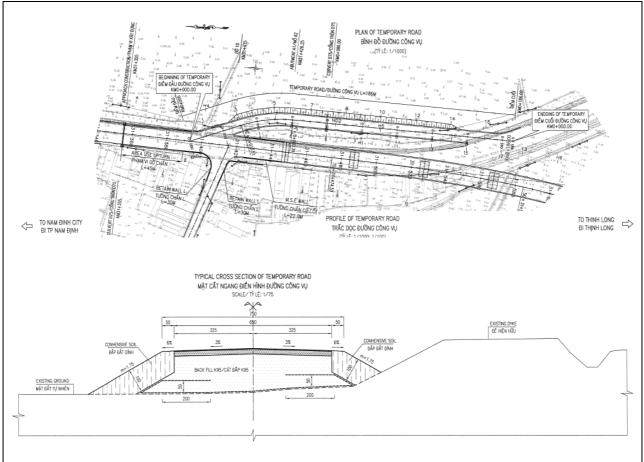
Layout and cross section of the temporary road at Northern road junction
